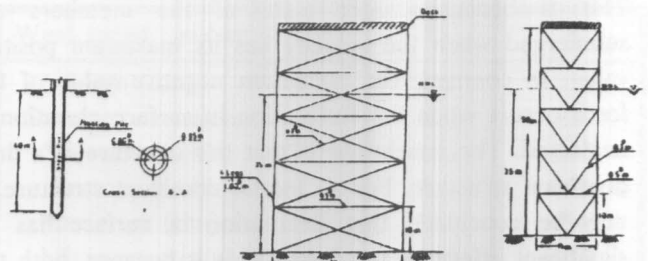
Short and long sides of the space frame and details of the pile foundation.
